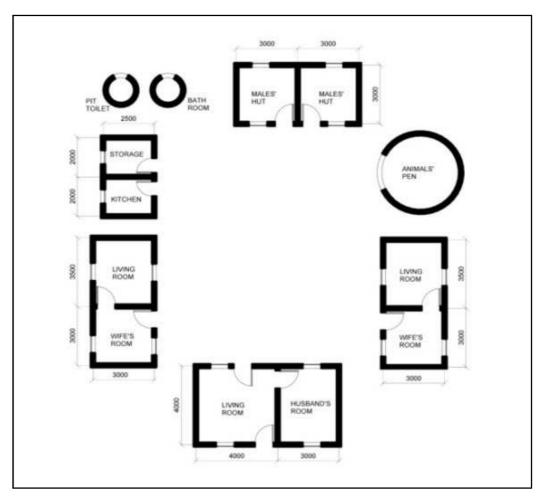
Floor Plan of Colonial Igala House Form without Impluvium. Source: Field Survey (2017).
